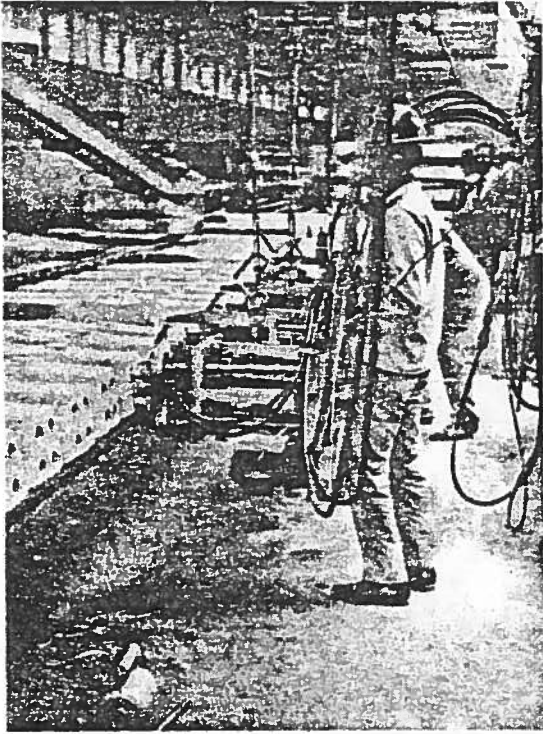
TENSIONING OF PRESTRESSING REINFORCEMENTS
